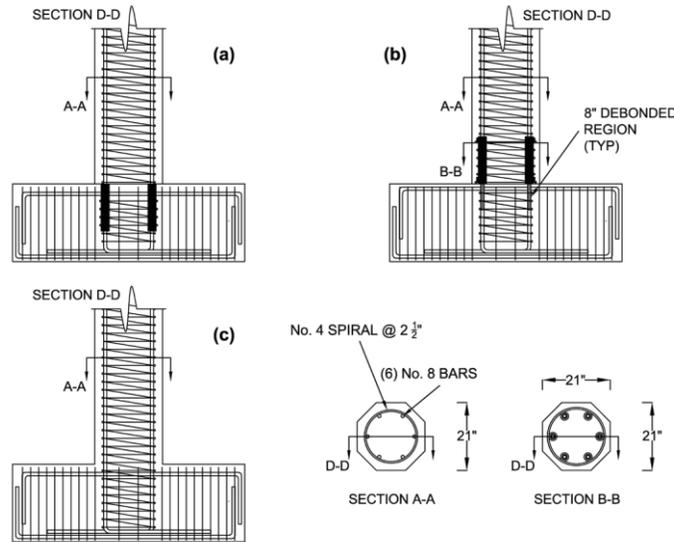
Details of specimens: (a) Precast-1, (b) Precast-2, and (c) CIP
